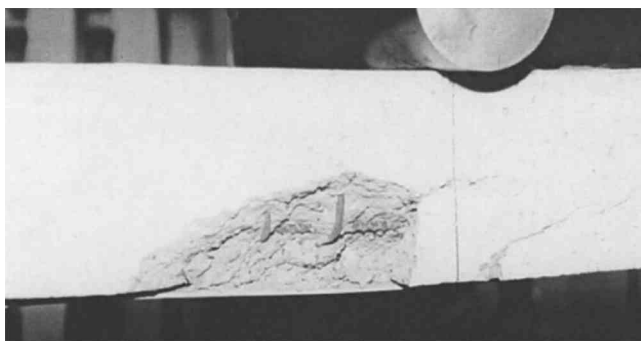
Spalling in F-42-S-102-(L) during testing caused by initial cracks.
